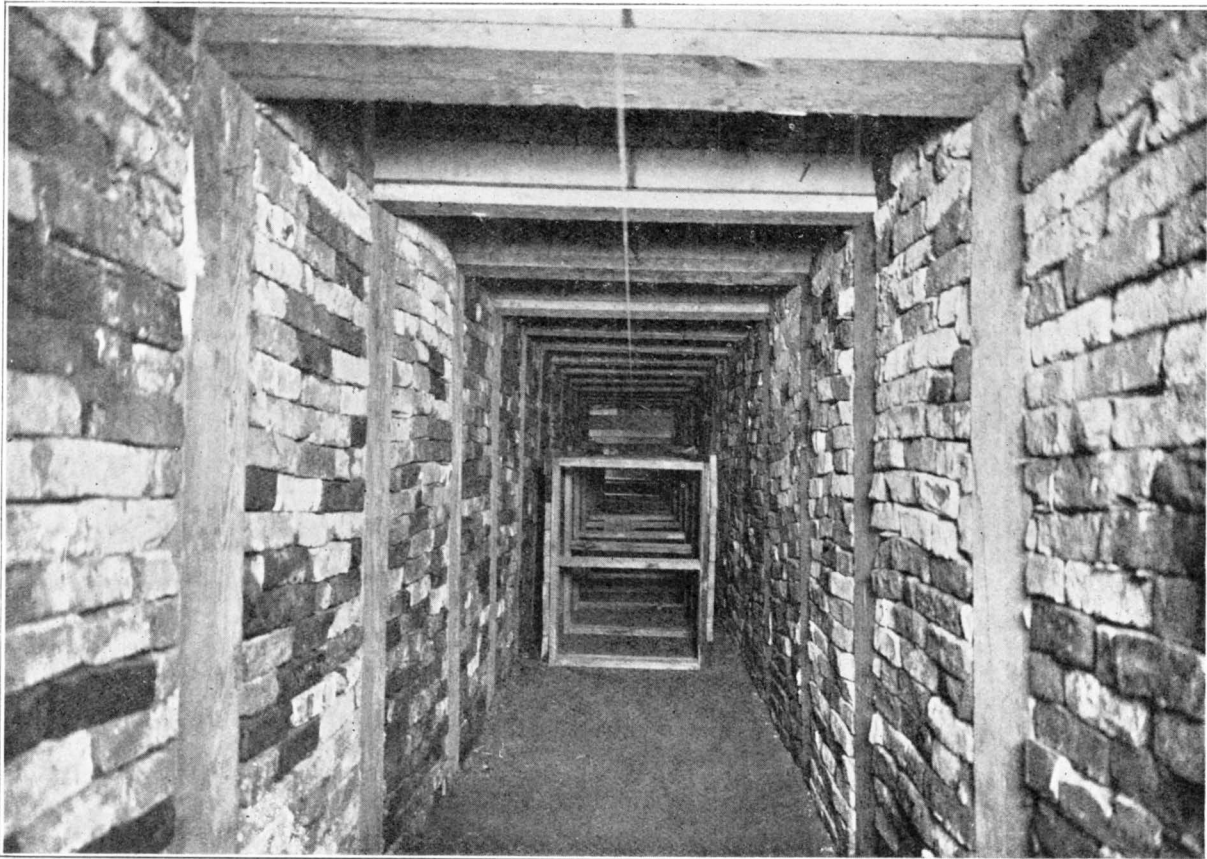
TUNNELLING: FORMERS FOR CONCRETE WALLS IN POSITION.
